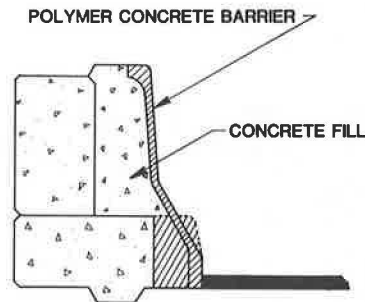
Schematic of half-shell used to protect parapet walls.
